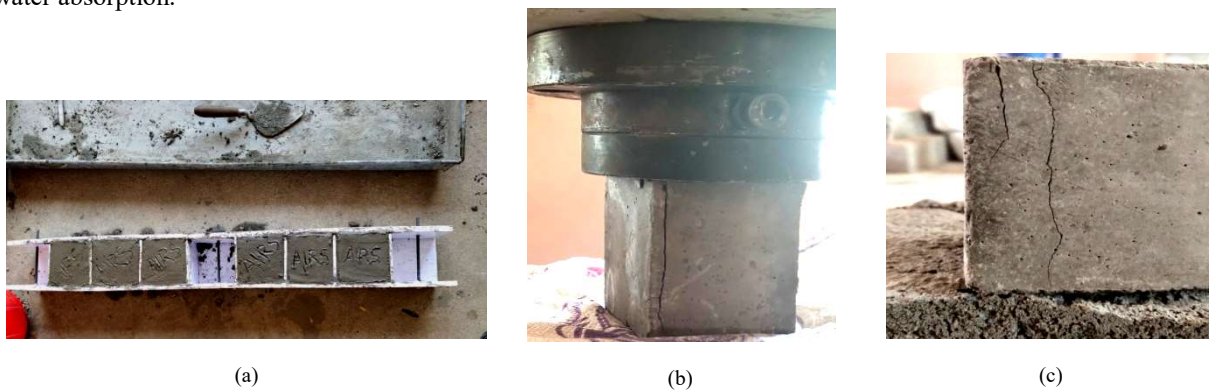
(a) Casting of specimens (b) Compressive strength test using universal testing machine(UTM) (C)Yielded specimen
